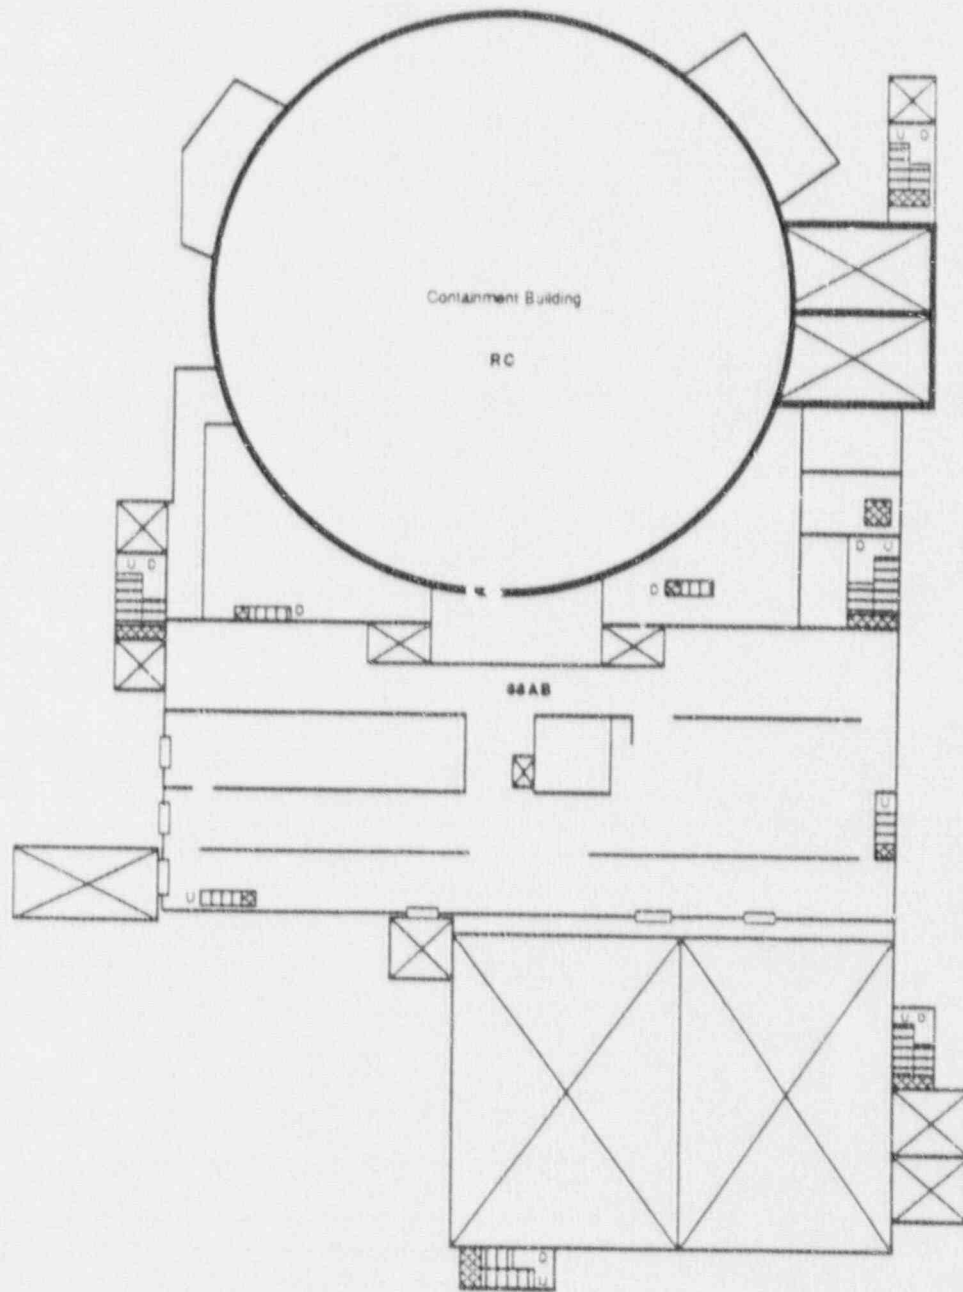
Palo Verde Power Block (Except Turbine Building), 88 ft. Elevation
